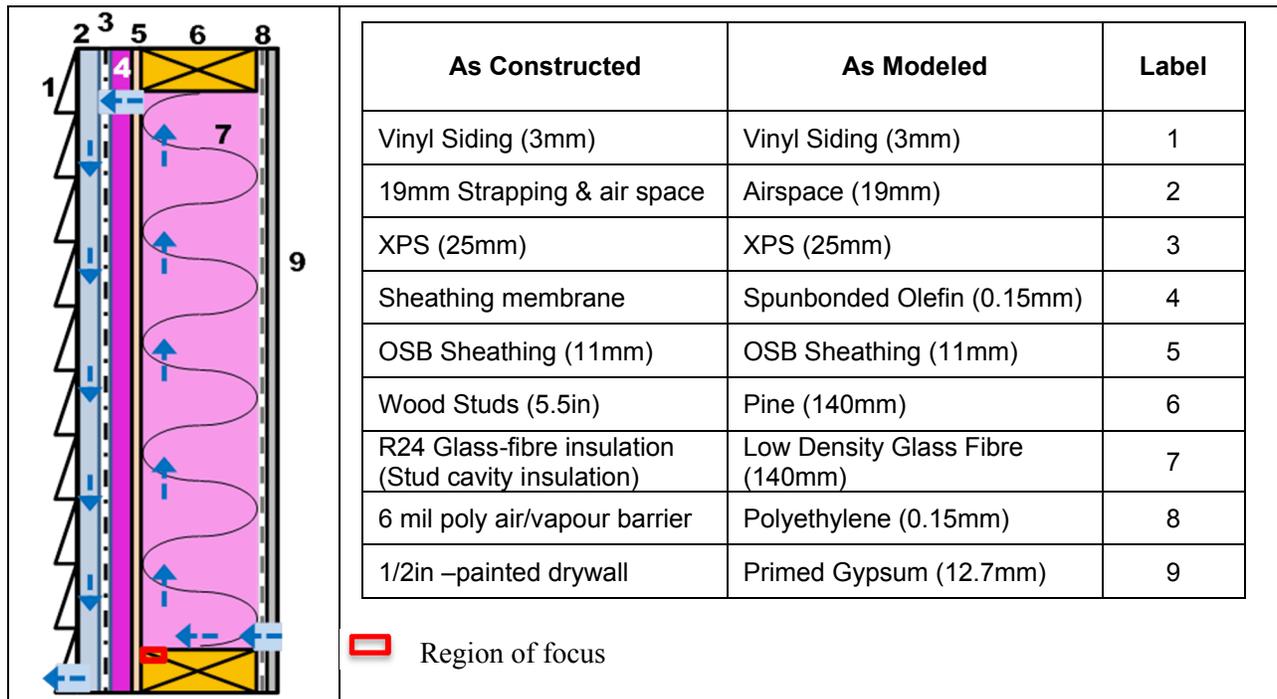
Example of wall assembly configuration and wall details to permit benchmarking the numerical model
